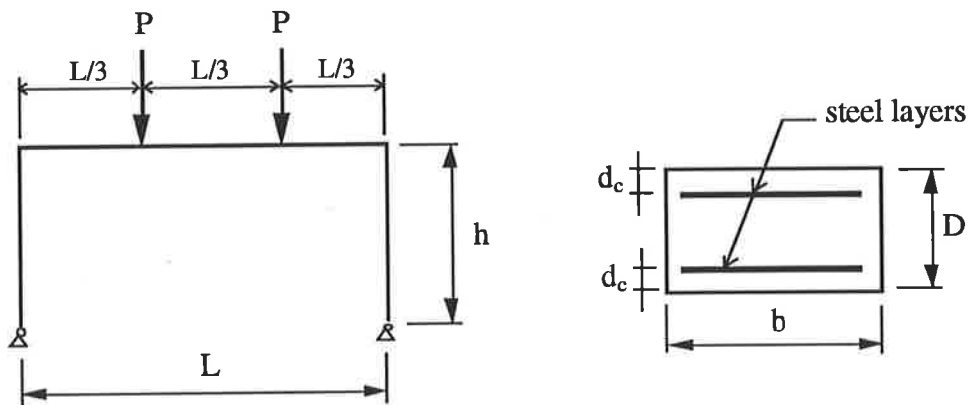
Test configuration and section parameters for frames tested by Ernst *et al.* (1973)
